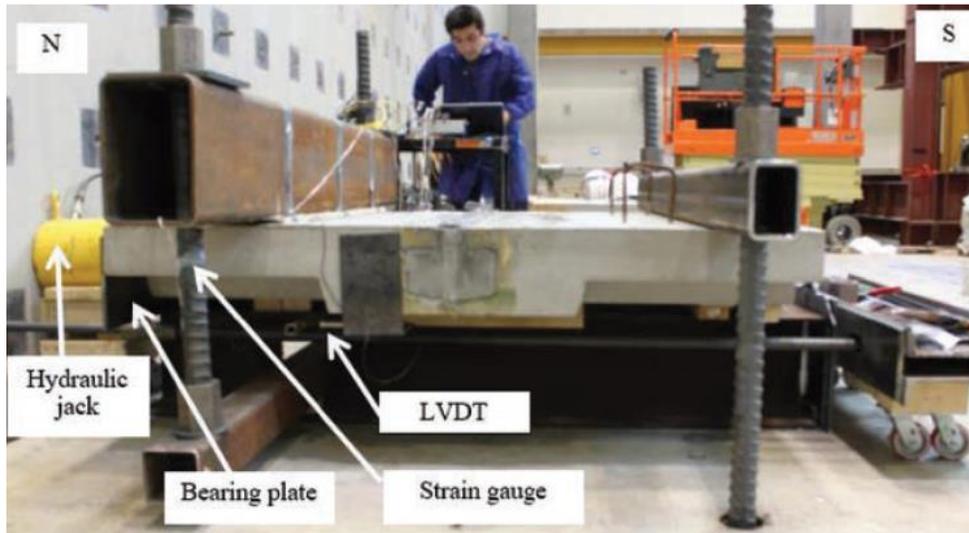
Push-off Test Setup for Steel Girder Specimens.
